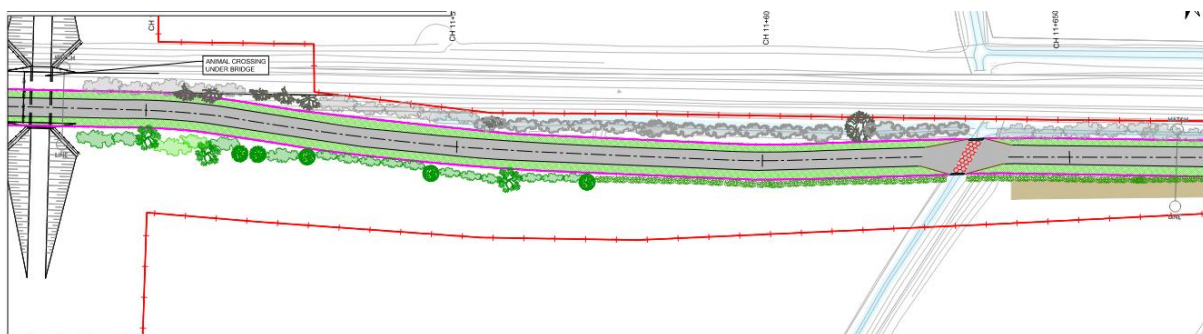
Greenway running east adjacent to the Carrowncalla South road showing underpass
